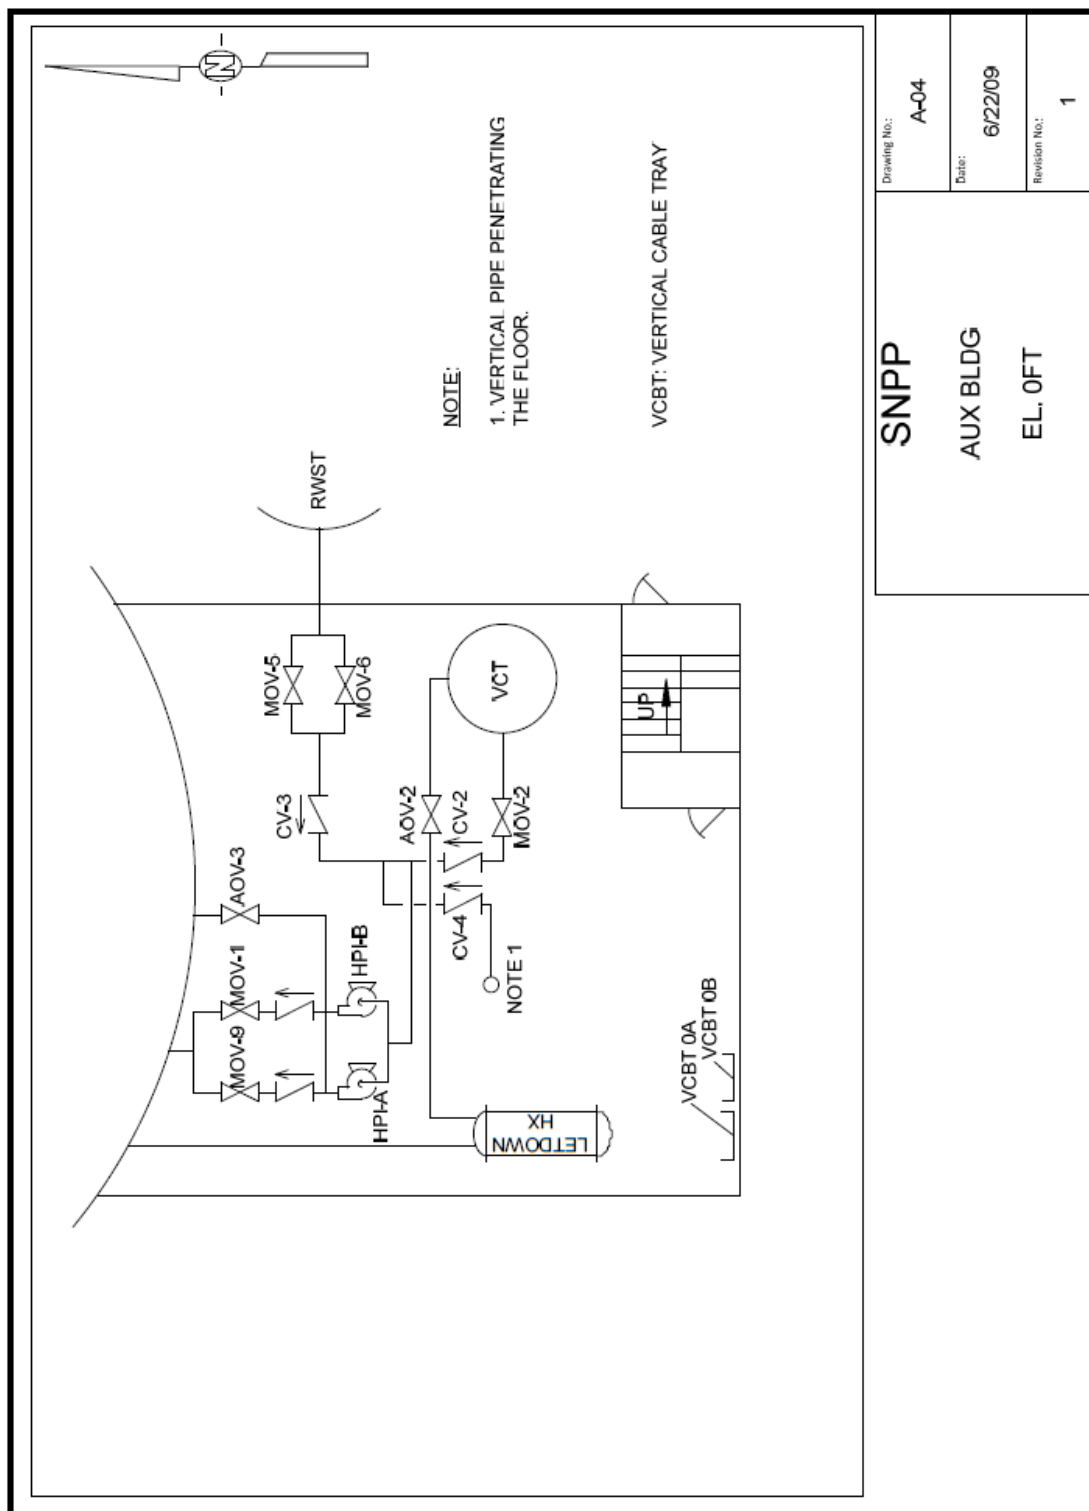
Auxiliary Building – Elevation 0 Ft
